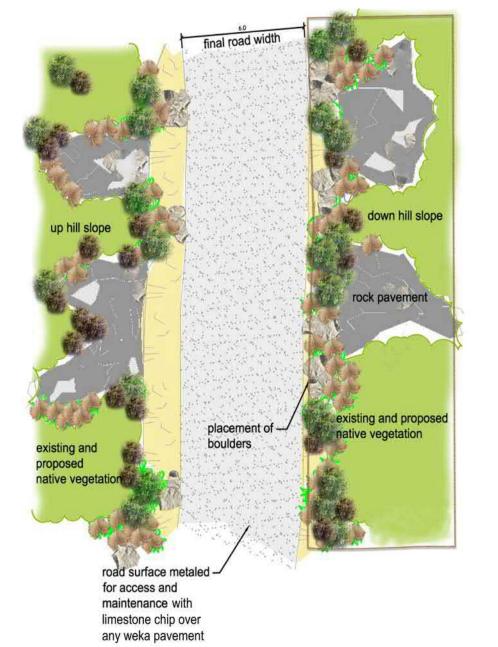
Turbine 2. Limestone pavement solutions, plan view.
